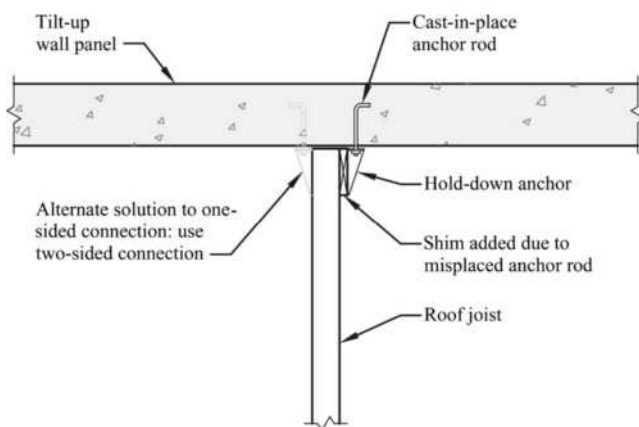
Plan View of Wall Anchor with Misplaced Anchor Rod
